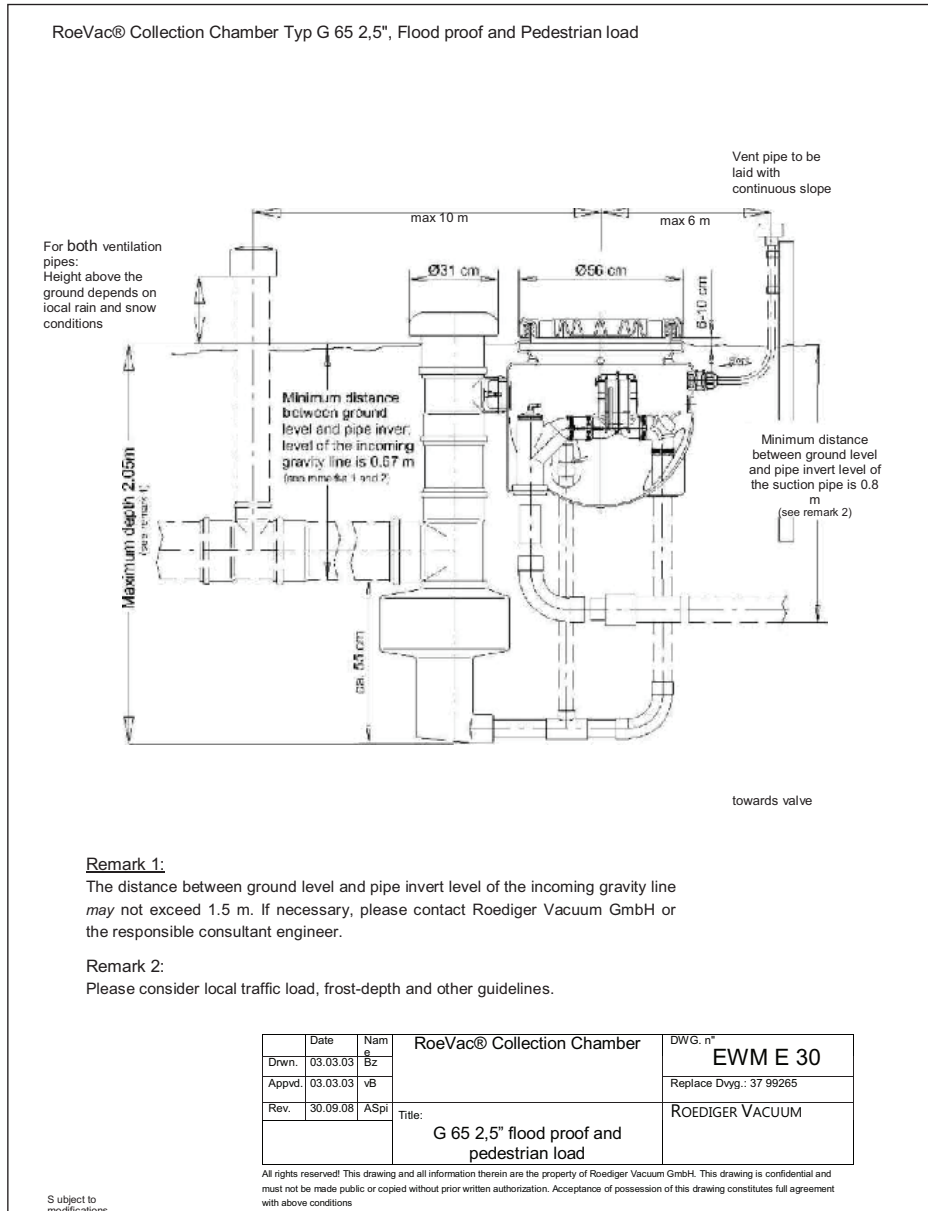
Roe Vac Chamber type G 65 2,5" flood-proof and pedestrian load: Installation
